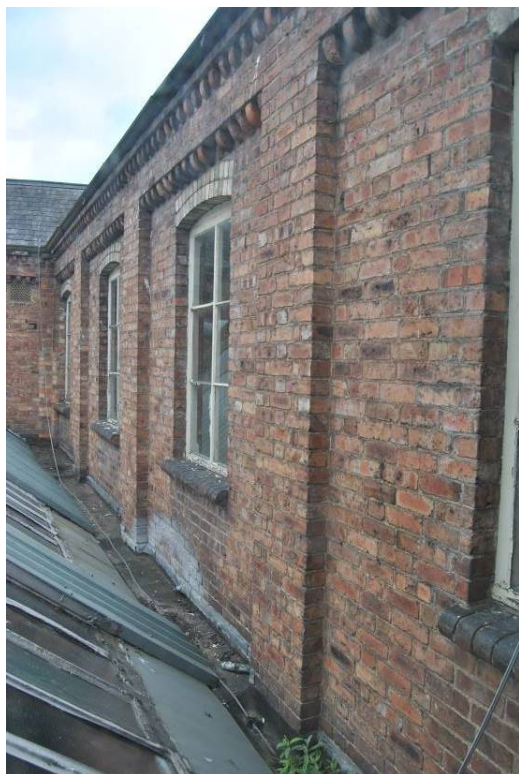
Building E, east elevation (1F) above roof of Building J. NB. form of primary, single-light windows.
